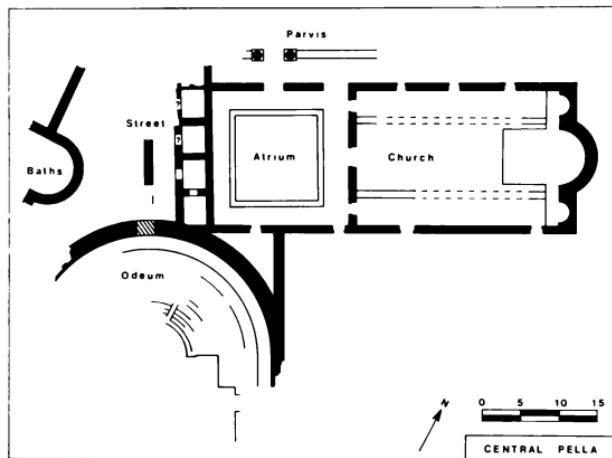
General plan of buildings in the Byzantine Civic Complex.
